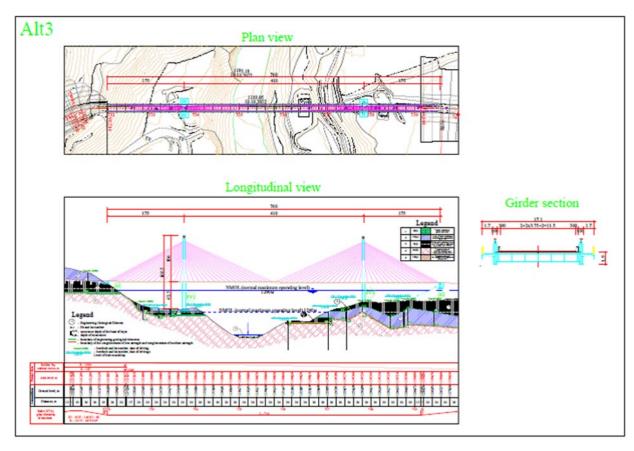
drawing and sketch for the Cable-Stayed Bridge
